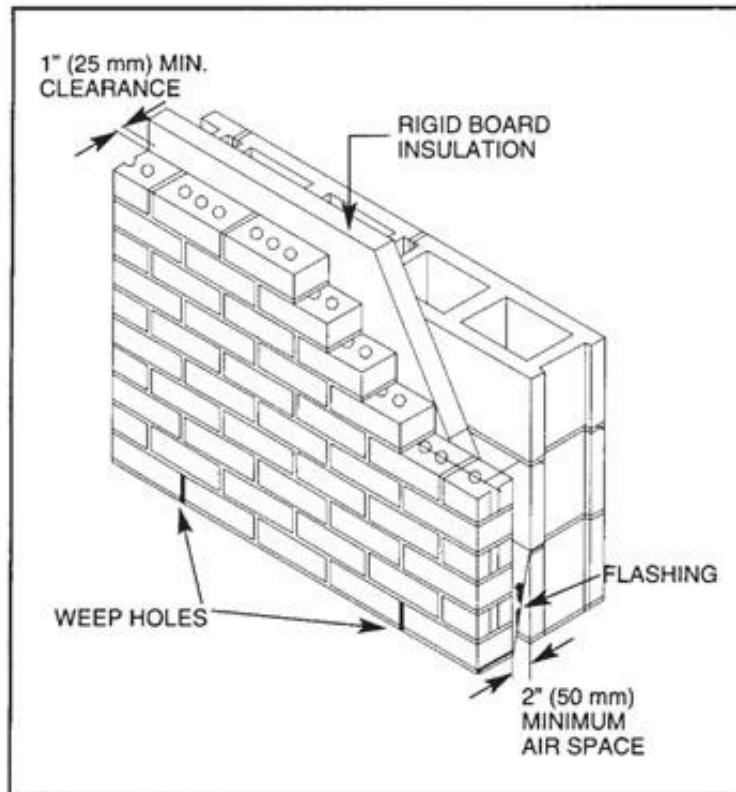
b. Brick clad masonry concrete panel ( Brick Industry Association.)
